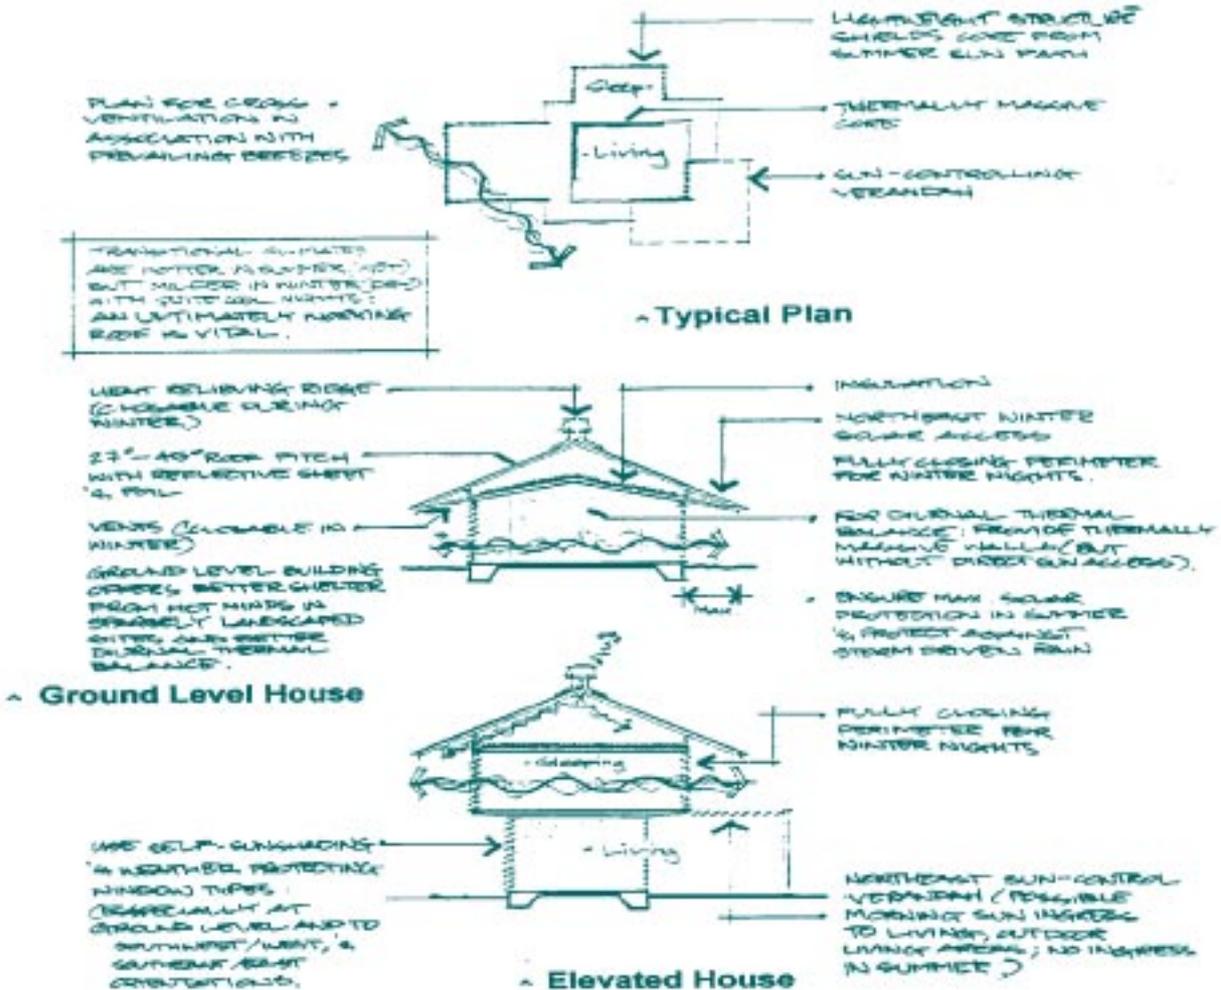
House design considerations for ground level and elevated dwellings in the Transitional Zone.
